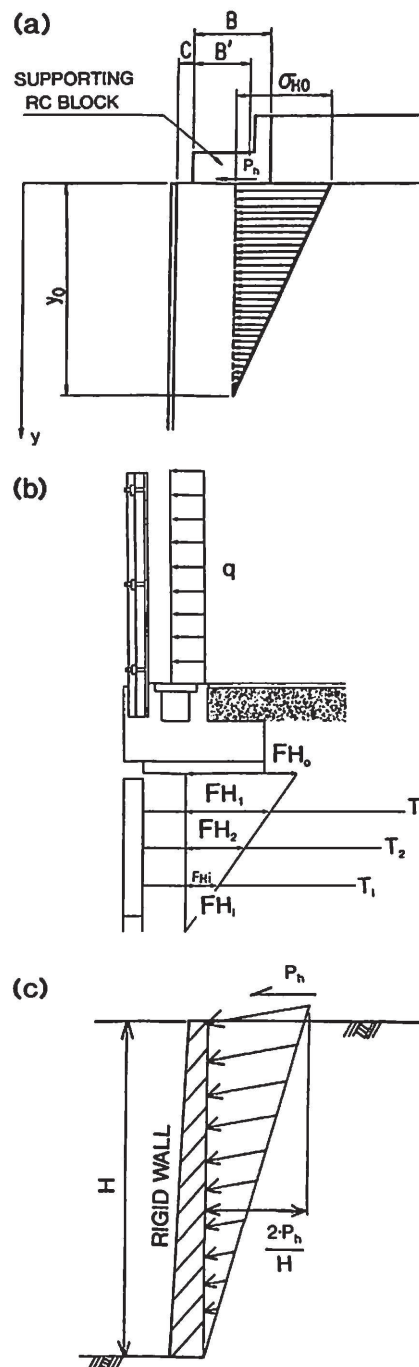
Design methods for concentrated outward lateral load on the crest of wall immediately behind the wall face; a) Terre Armee wall bridge abutment (reproduced from CERC manual (1989), b) Terre Armee wall having a tall noise barrier wall, and c) GRS retaining wall with a rigid facing.
